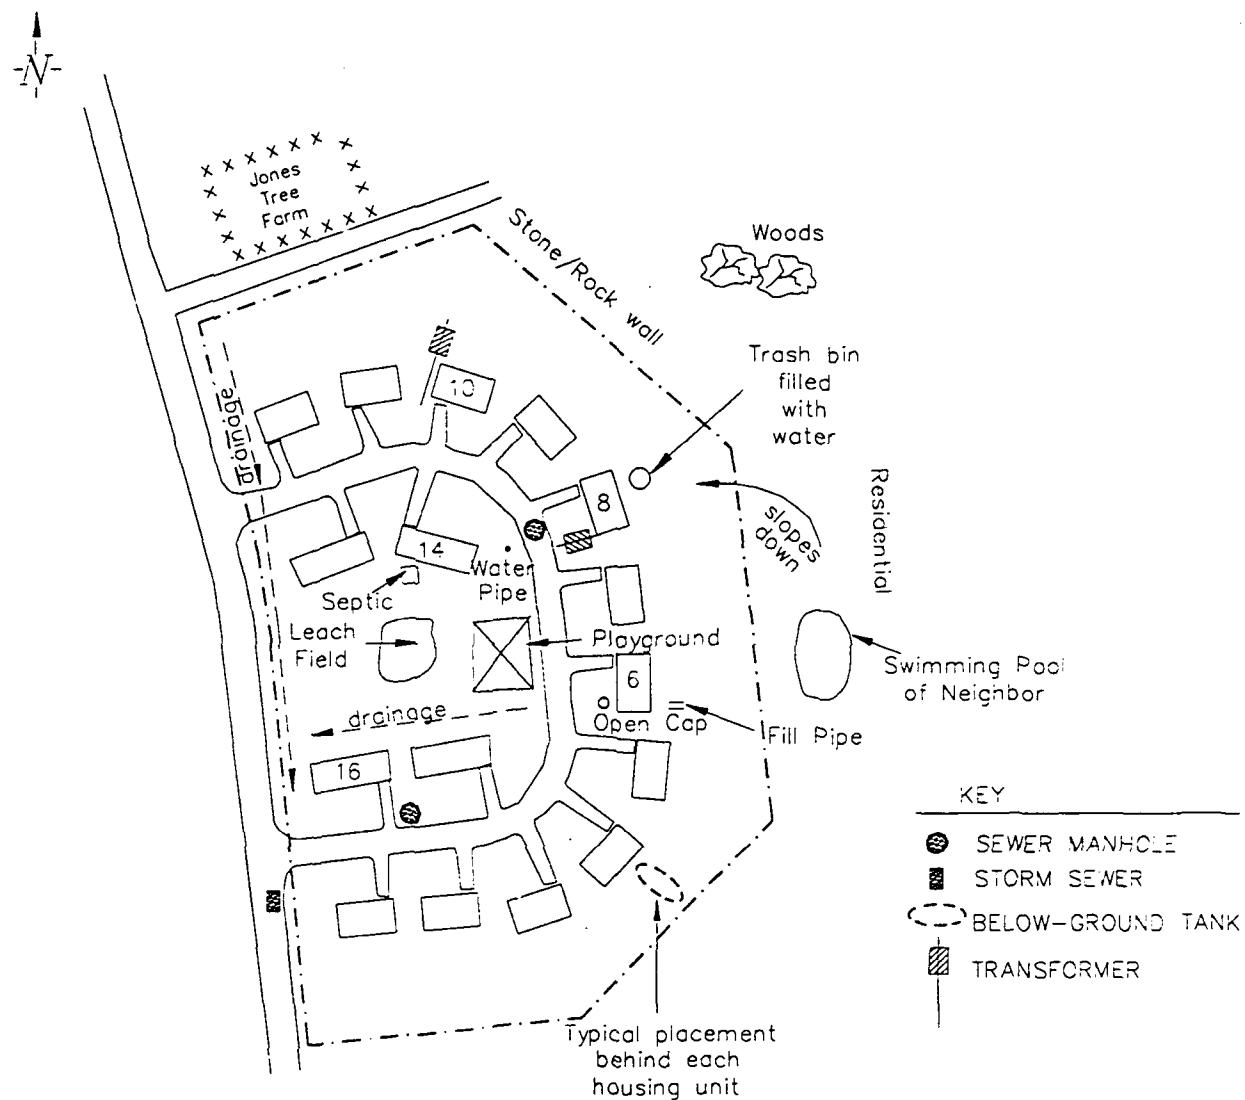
Site Plan Map of Shelton Army Housing Units
